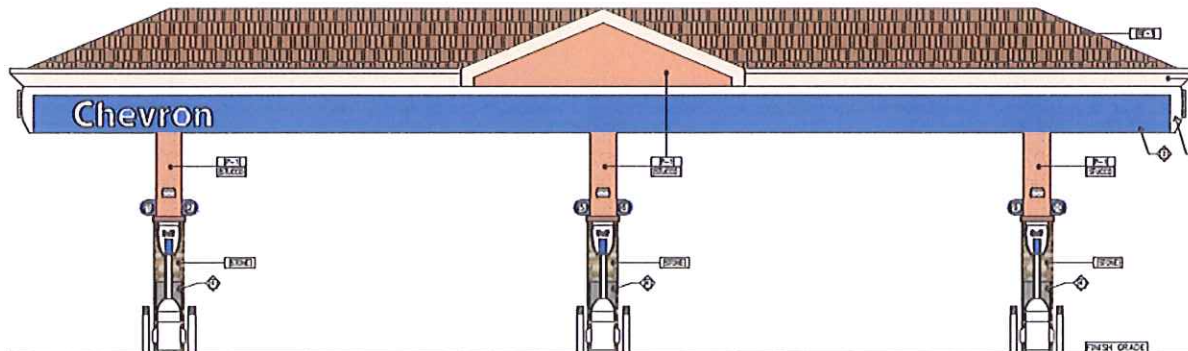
South Elevation (gas canopy looking North from Laurel Road)
